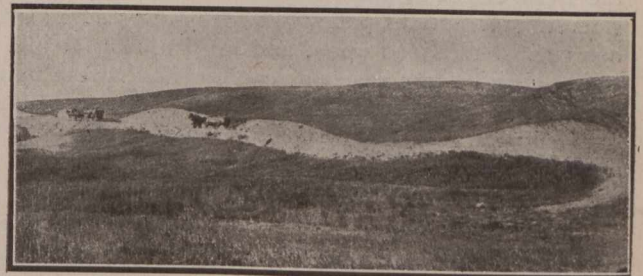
Typical Side Hill Grading, Saskatchewan.
